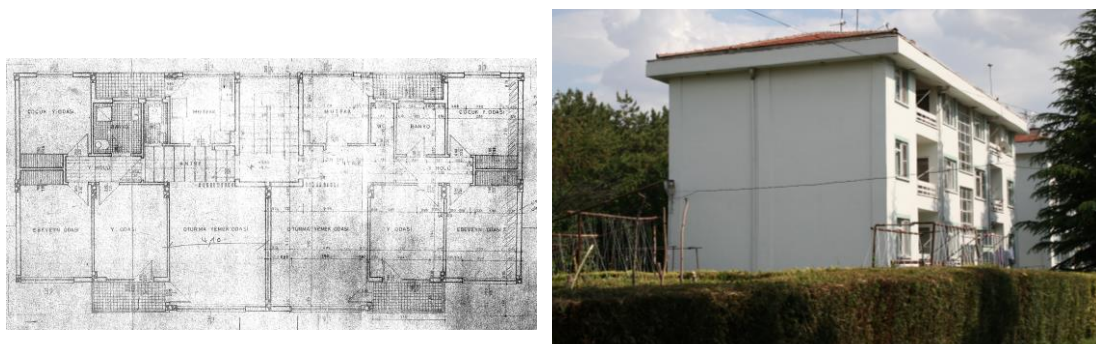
Floor plan drawn in 1982 and photo taken in 2014 of the apartments in the third block
